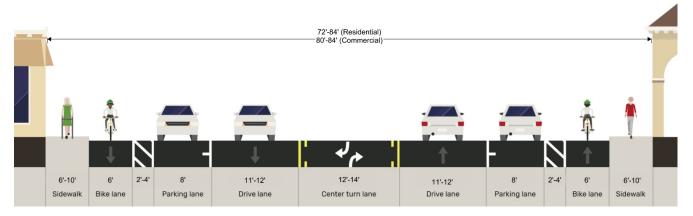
Proposed Typical Section for Secondary Arterial (Parking-Protected Bike Lanes)
